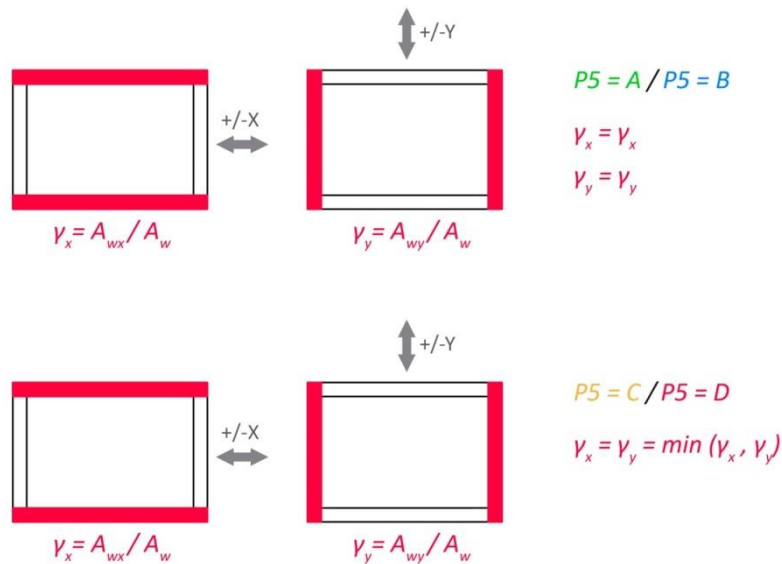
When evaluating buildings with type C or D horizontal diaphragm, the in-plane index (γ_i) should be the minimum obtained from two directions (plan view)
